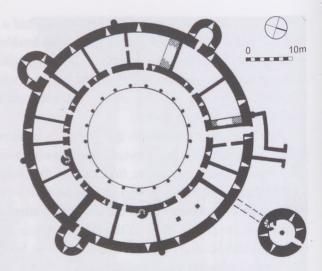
The plan of the ground floor of Castillo de Bellver, Palma de Mallorca
